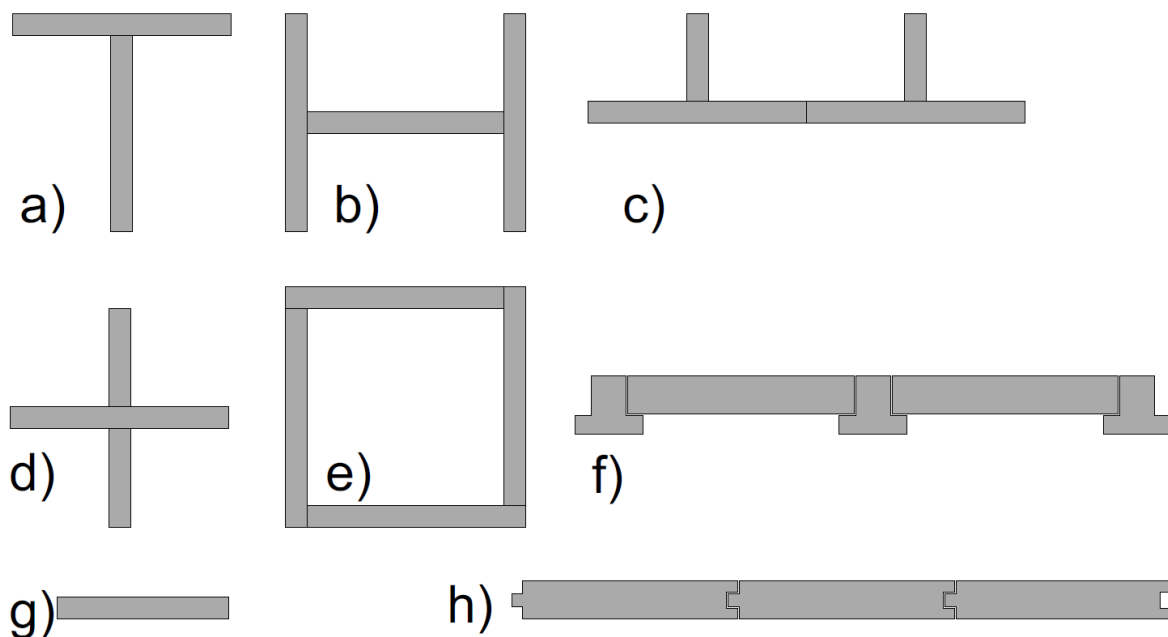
a),b),d),e) slurry wall pillars, c) ribbed slurry wall, g) wall panel, f),h) precast slurry wall panels
